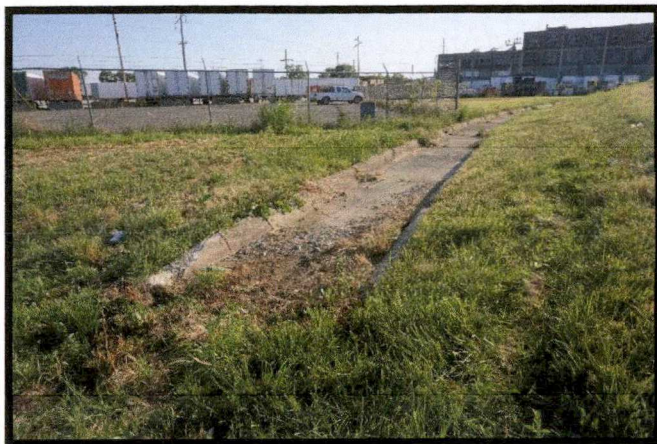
Concrete drainage swale, southwestern side of Taracorp pile cap (view west).
